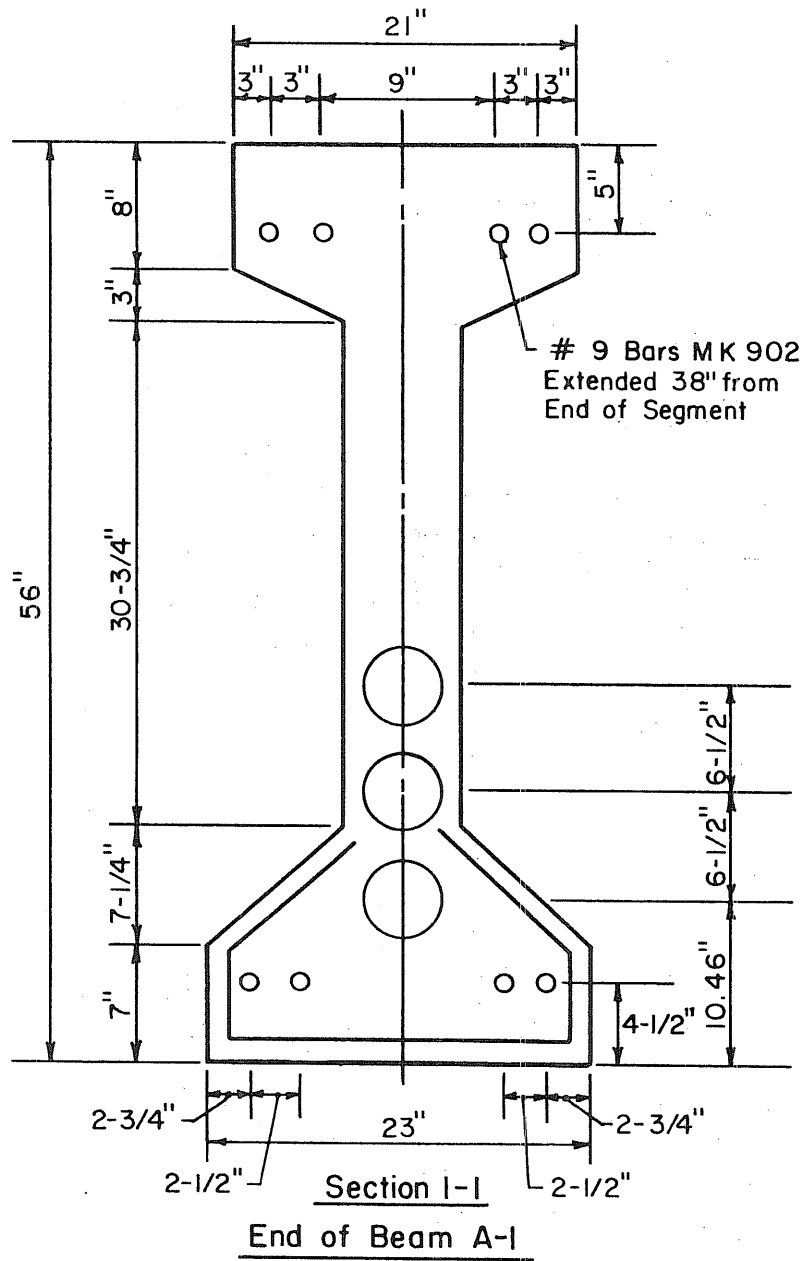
REINFORCEMENT AT SECTION AT CENTRAL PIER
